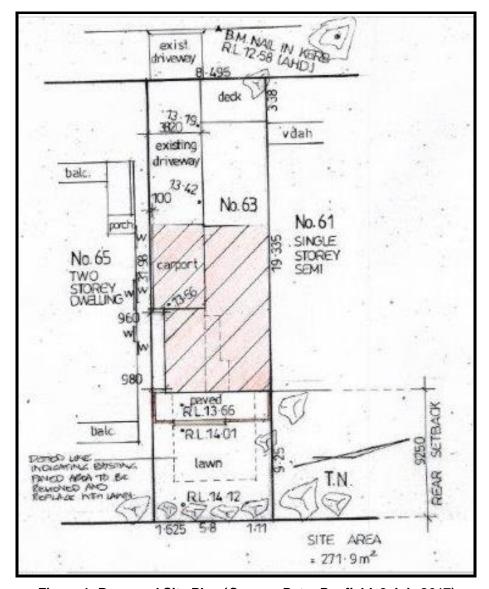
Proposed Site Plan (Source: Peter Banfield, 3 July 2017)
